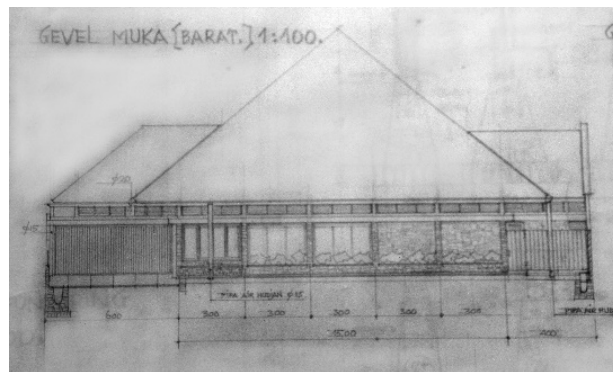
Front elevation of the final plan of Residence of Lie A Hong (around 1969)²⁾
